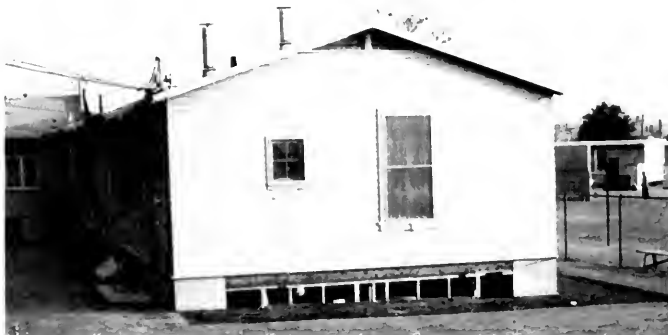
Hubbard Street Elementary School. Repairs being made to underpinning of a bungalow.
